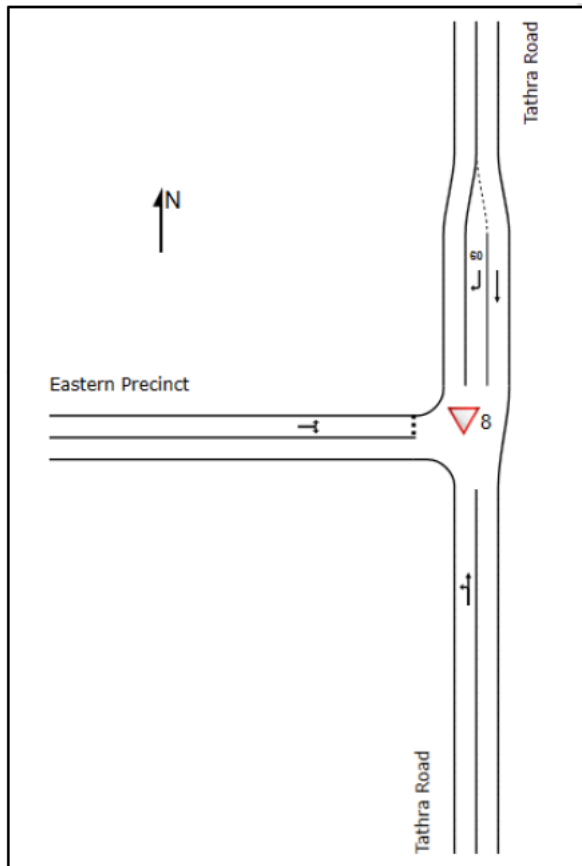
Tathra Road access intersections layout (source: GHD, 2025)
